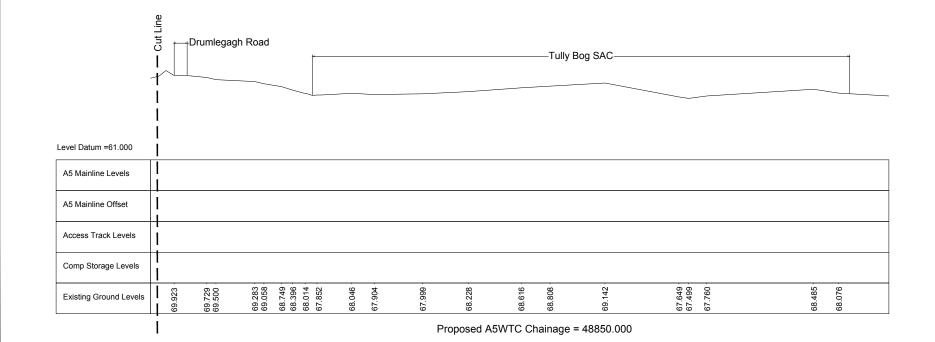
S2-0800-1484: Proposed Flood Compensatory Storage adjacent to Tully
